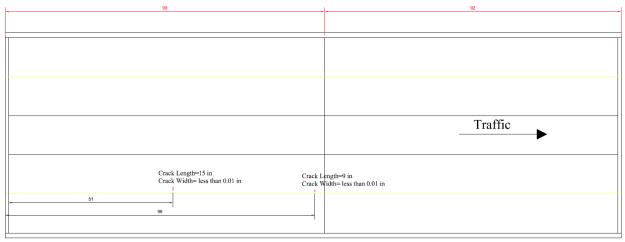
Cracking on southbound, inner lane of the normal concrete deck
